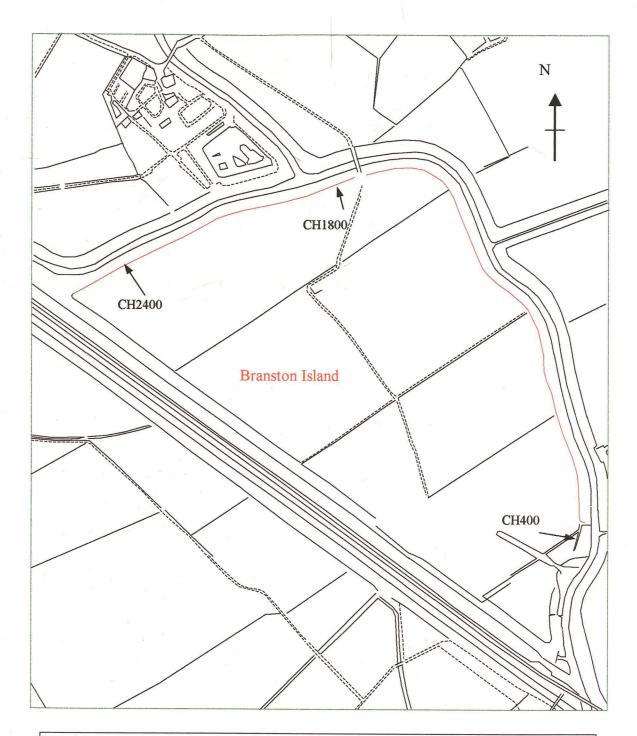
Location of section of soke dyke that was subject to groundworks, shown in red; plan at 1:10,000.
